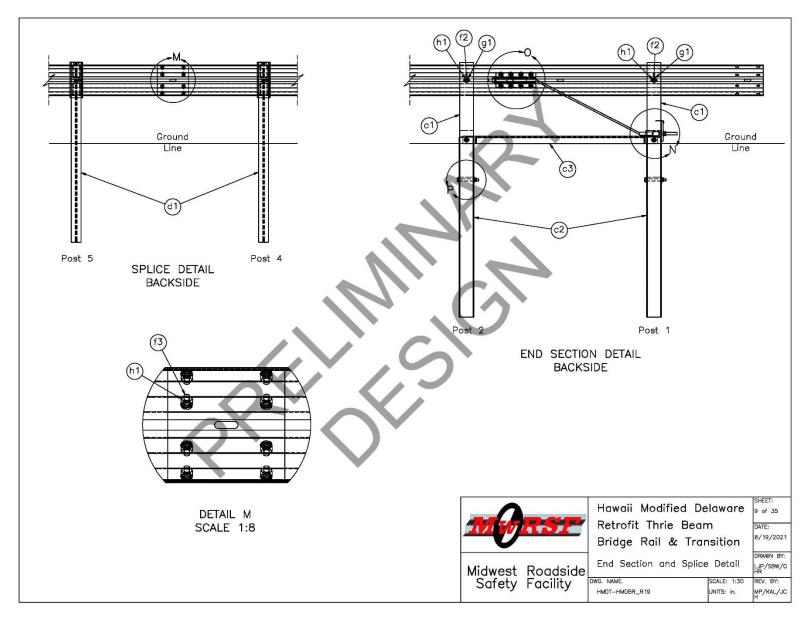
End Section and Splice Detail, Test No. HMDT-1
